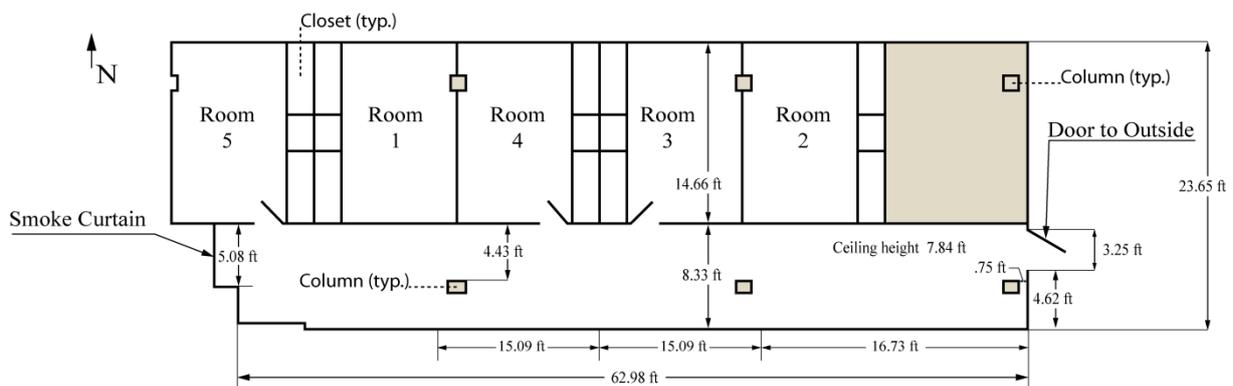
Floor plan for the ground floor. (Image: NIST)
